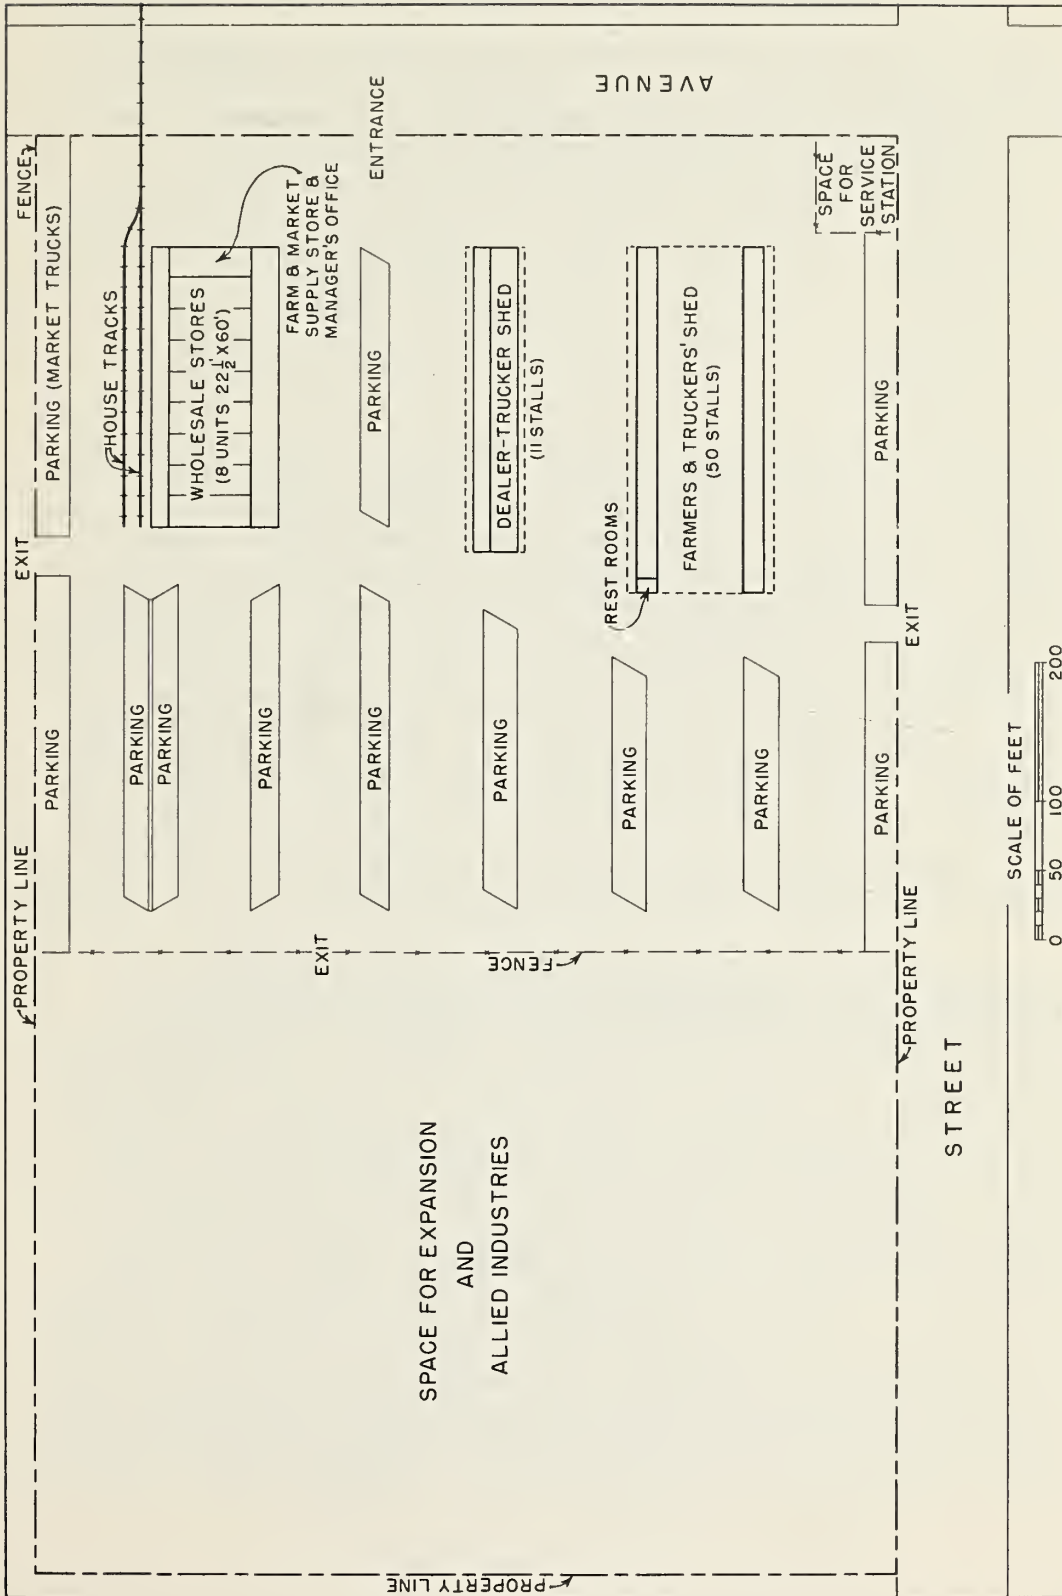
Possible arrangement of facilities for a wholesale produce market on a site containing 15 acres, Birmingham, Ala.
